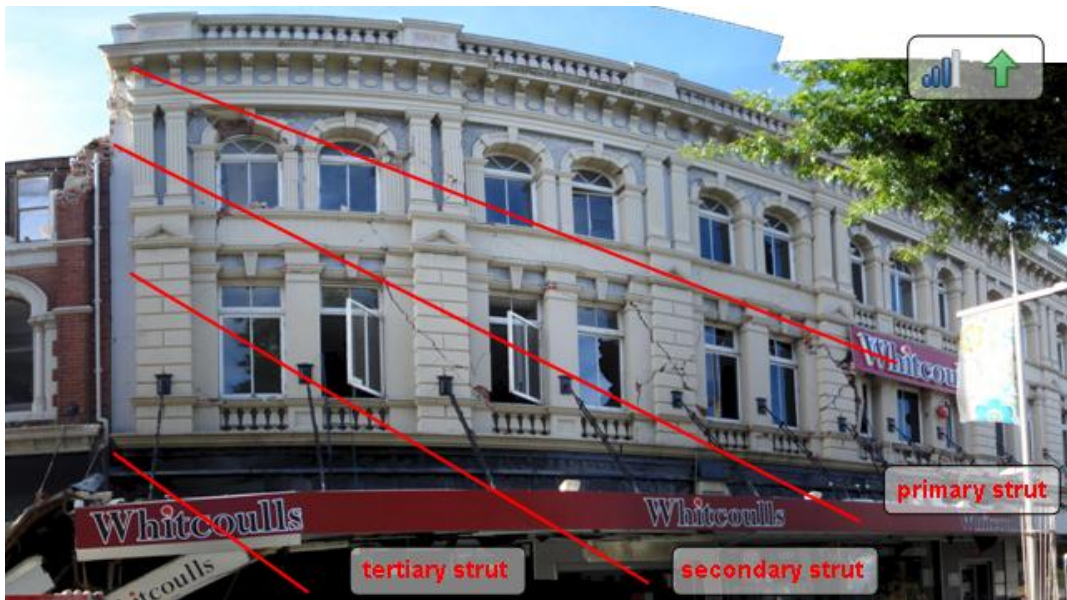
Damage associated with compression struts (panoramic image). Struts from the impact of three floors of an adjacent building are highlighted.
